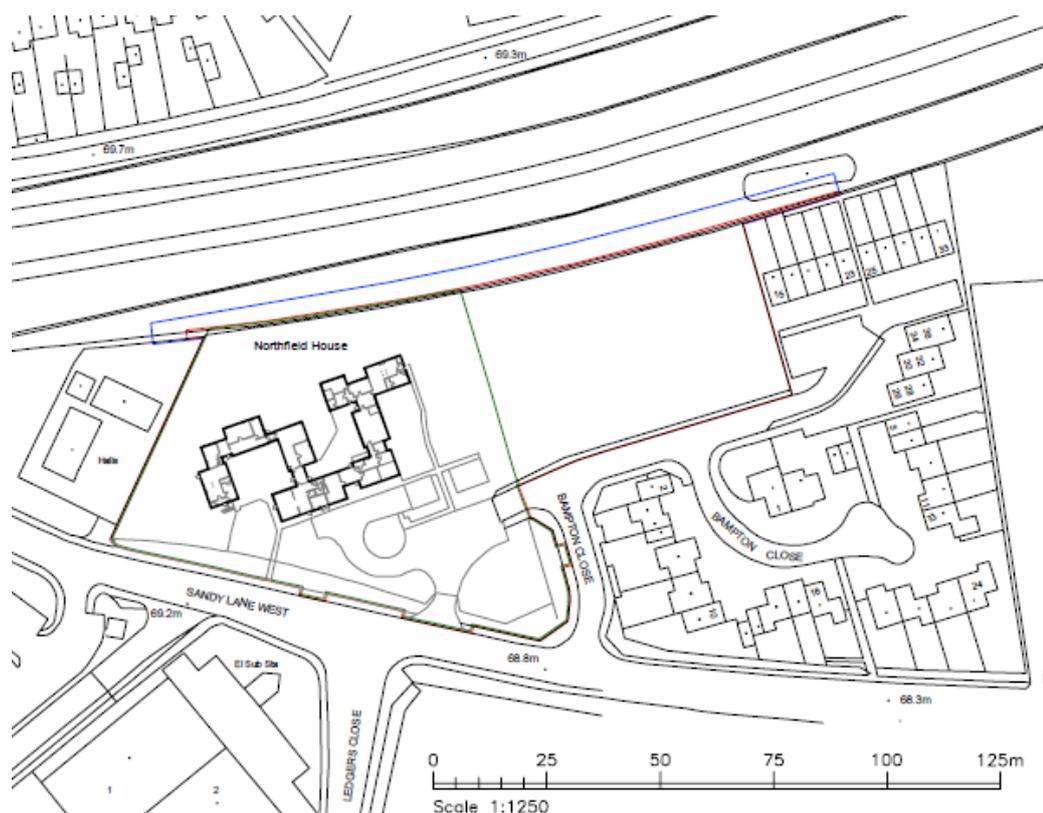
Site location plan; green line denotes the part of the application made in full and the red line outlines the complete site.
